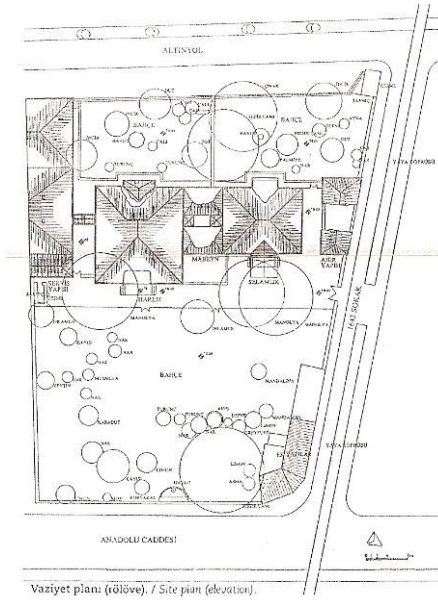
The site plan of Yahya Paşa House in Bayraklı.
